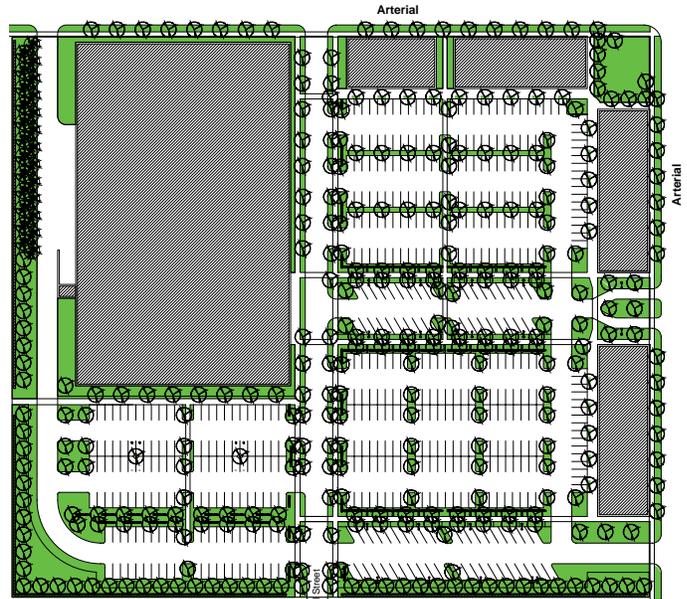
D.2: Diagram showing landscaped areas which count toward the site landscaping requirement.
